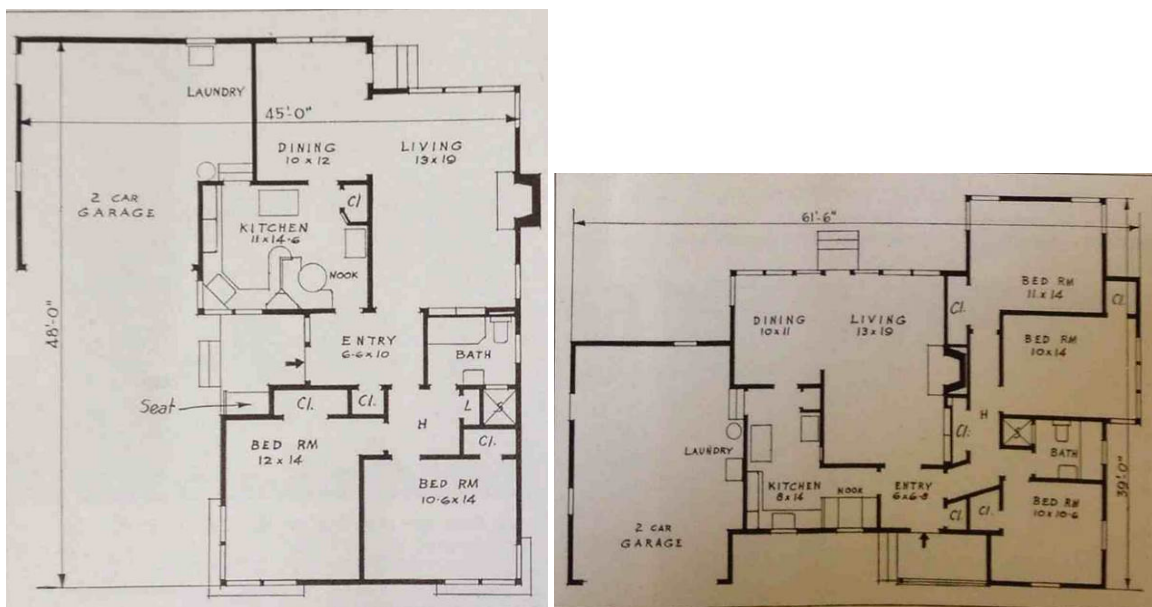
Left: Plan of two-bedroom ranch model based on Gardner Dailey’s *LIFE* House plan. Right: Plan of 1941 three-bedroom ranch. Source: *American Builder*, July 1941.
